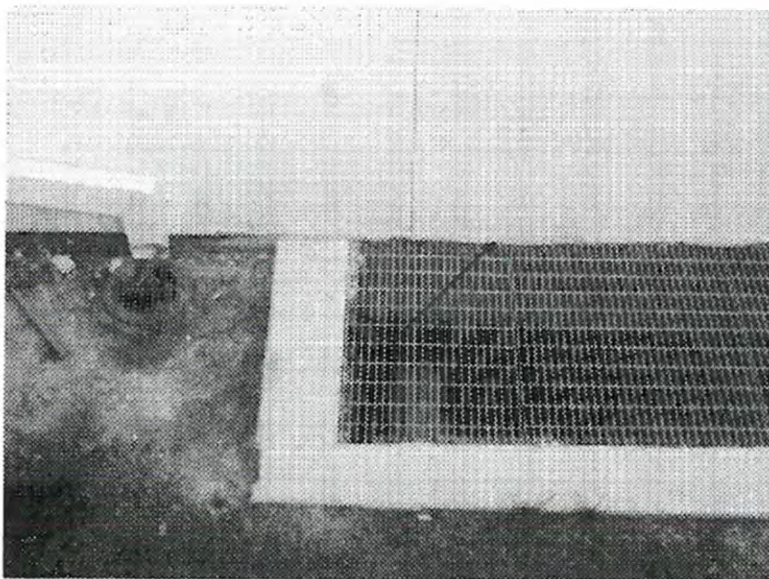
Uneven termination of stucco at wall base above garage vent on east side of Building C.
